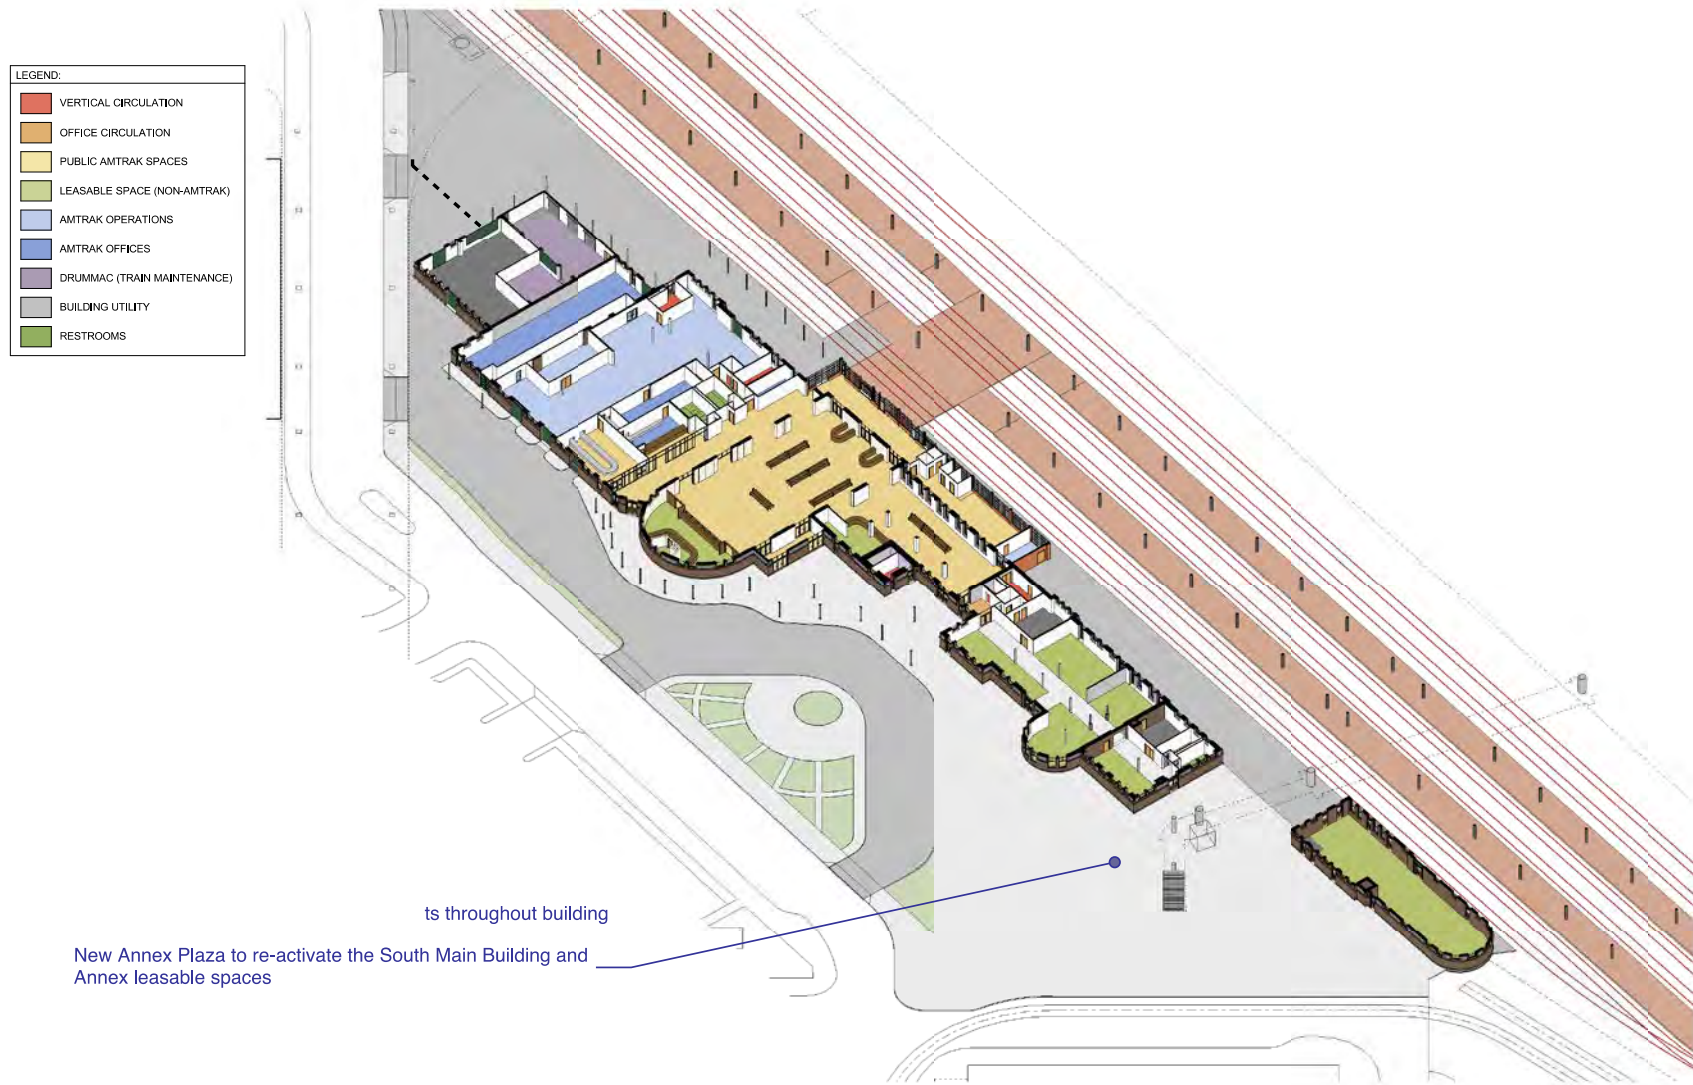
Proposed Conceptual Design Building Improvements - Second Floor
